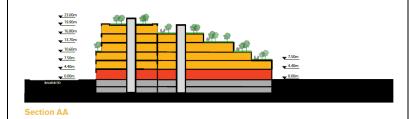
Illustrative cross sections from Urban Design Report. Balmain Road is to the left, Fred Street to the right. Site is shown flat and has not accounted for a 2.5 m to 3m fall to Fred Street.
